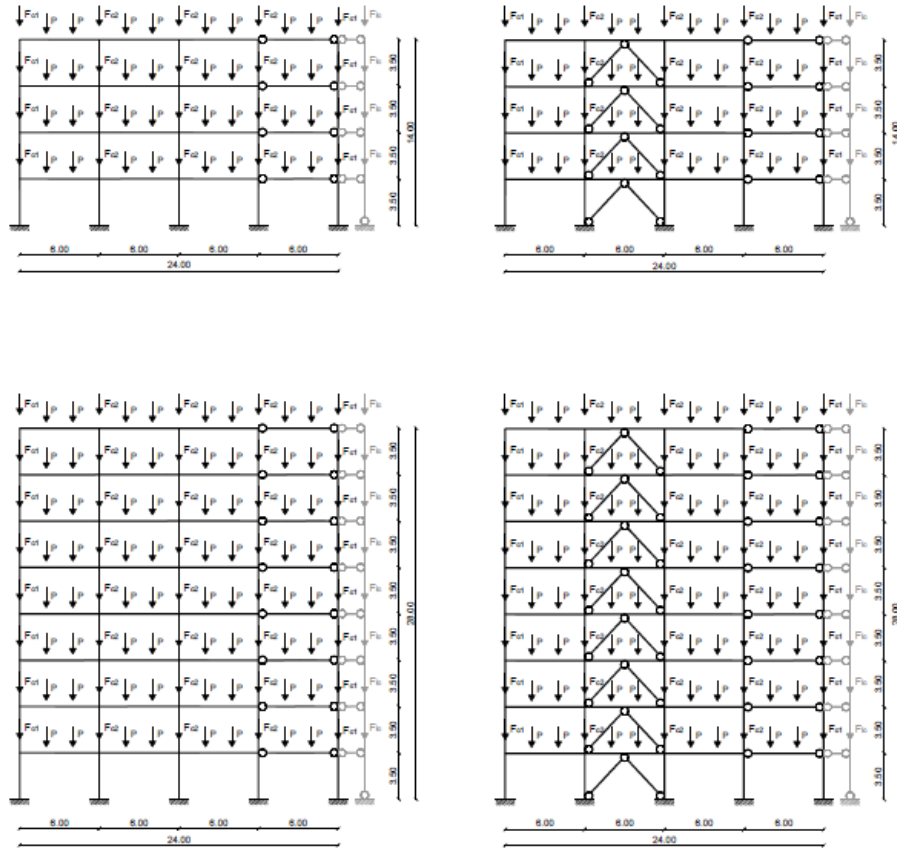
Elevation configuration of the building (MRF and D-CBFs) for Y-direction.
